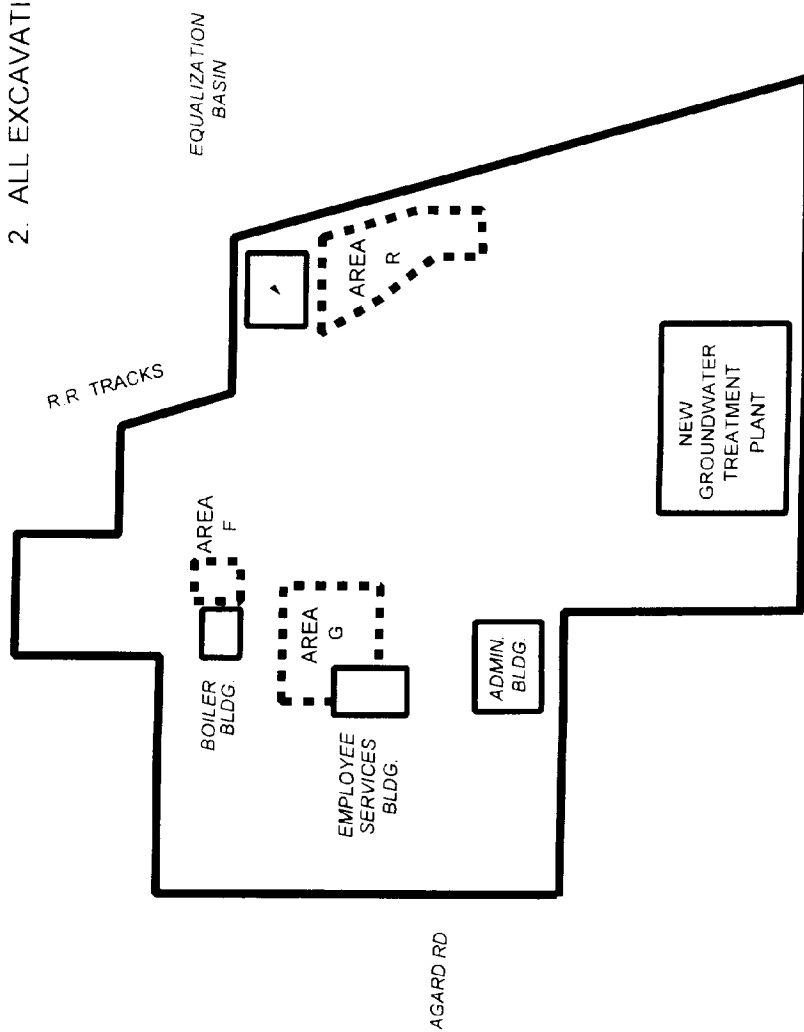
EXCAVATION AREAS FOR REVISED O.U. #3 REMEDY
